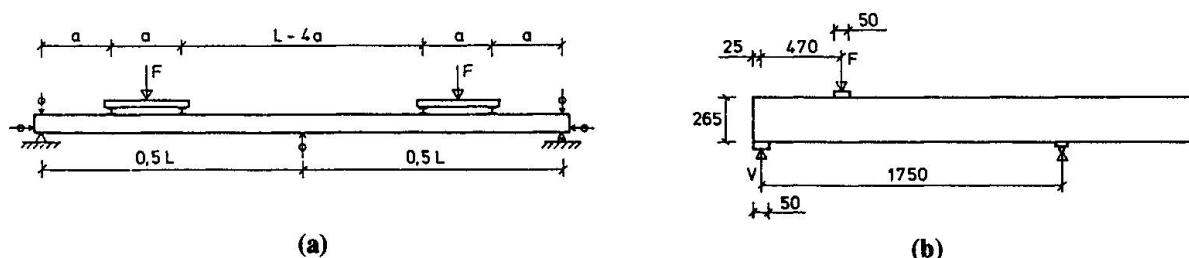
Test layout. (a) quality control tests, (b) Jonsson's tests.
